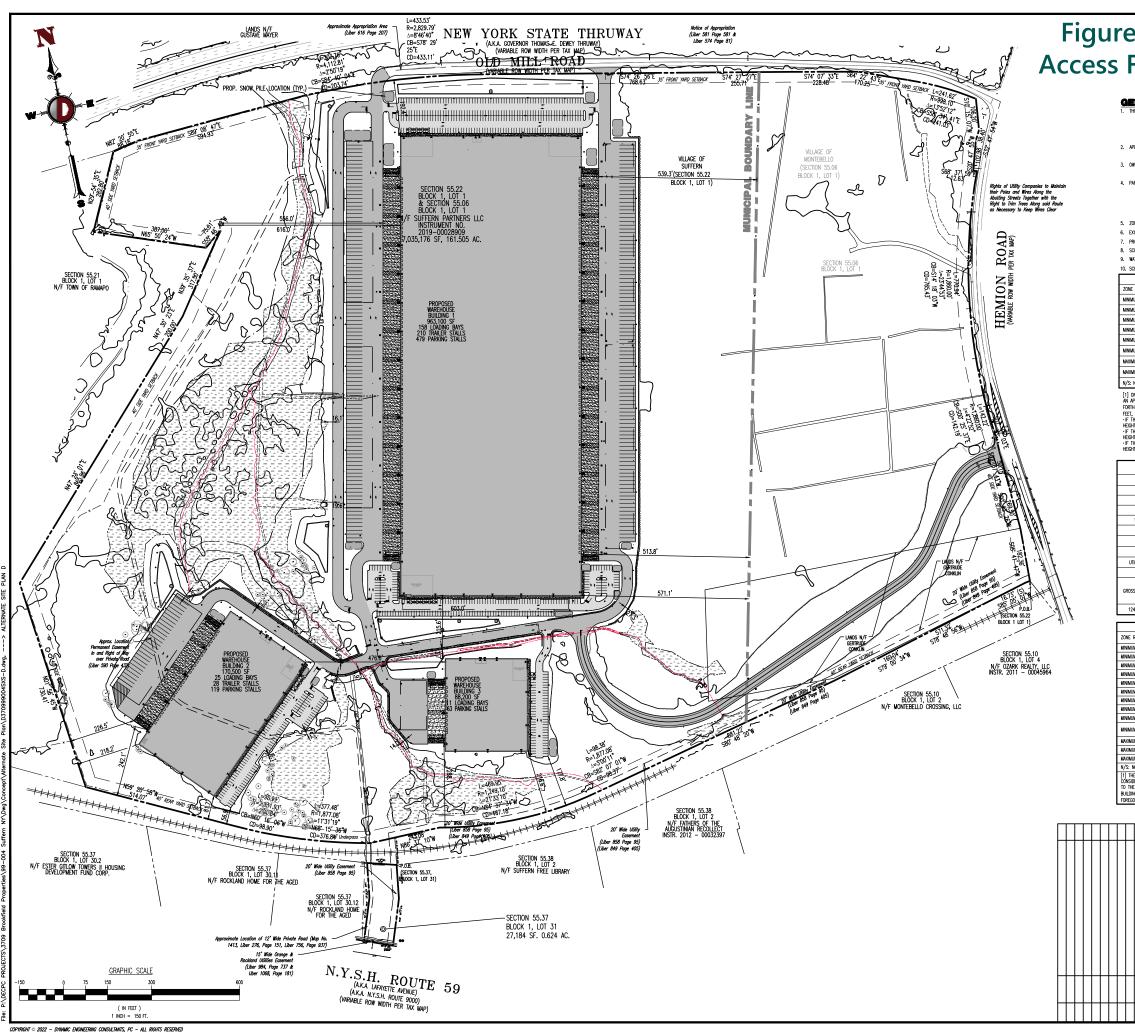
Alternative D-Improved Access From Hemion Road (Southern Access) Site Plan GENERAL NOTES:
